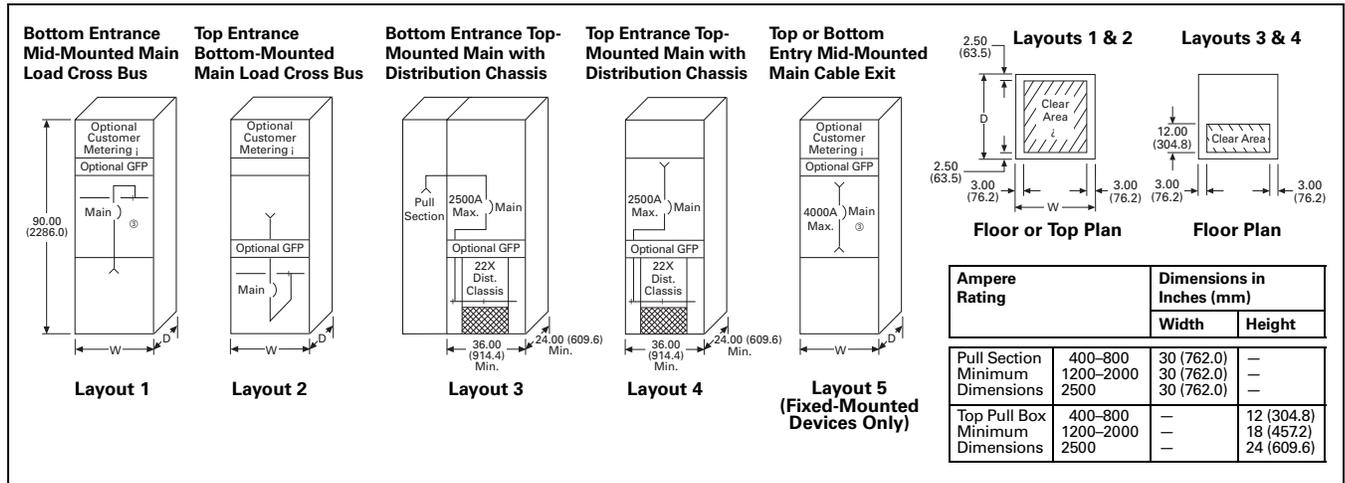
Main Structure Layouts—Dimensions in Inches (mm)
